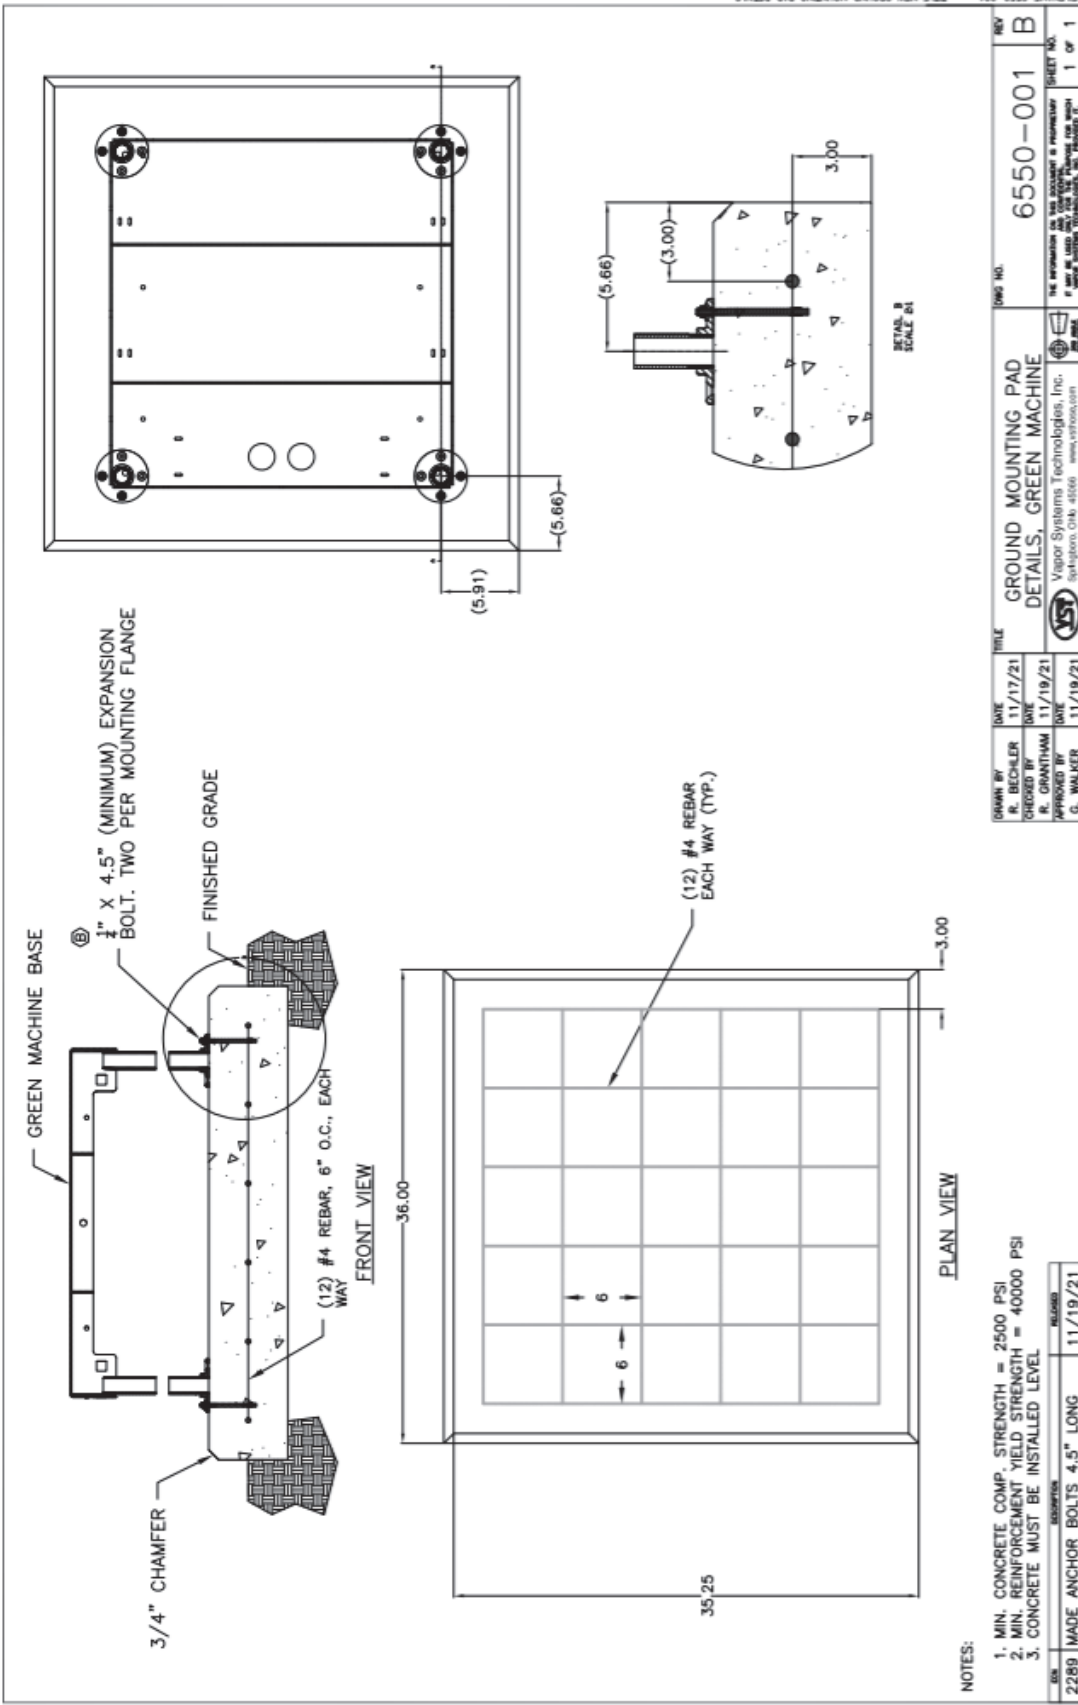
GREEN MACHINE Ground Mounting Pad
